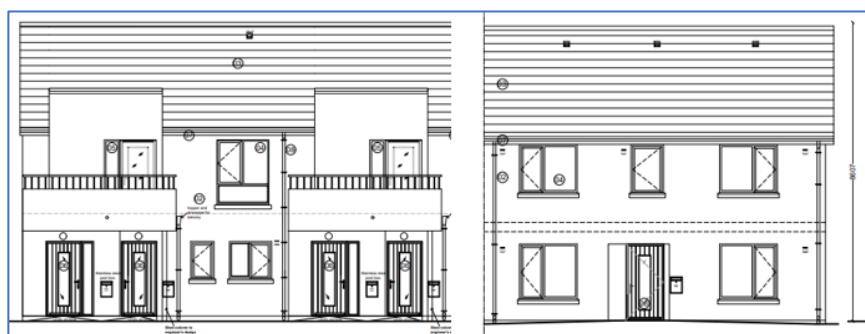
Front elevation of Type A (left) apartments and Type C (right) semi-detached.
